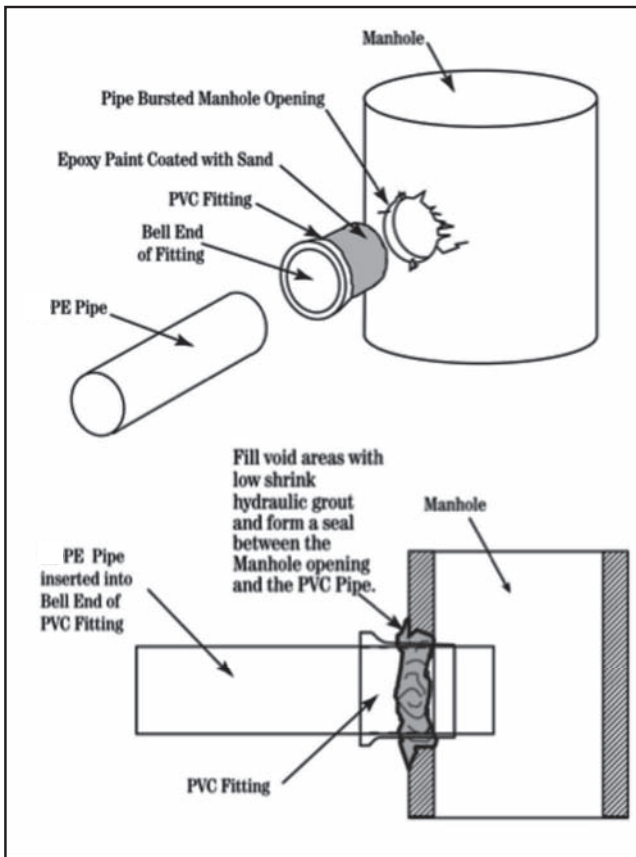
Connecting PE Pipe to Old Manhole with Damaged Inlets/Outlet
